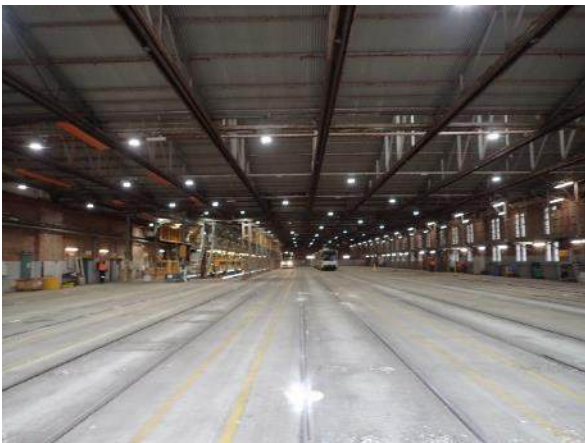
View of Roads 2 to 9 inside the tram shed building, facing east
